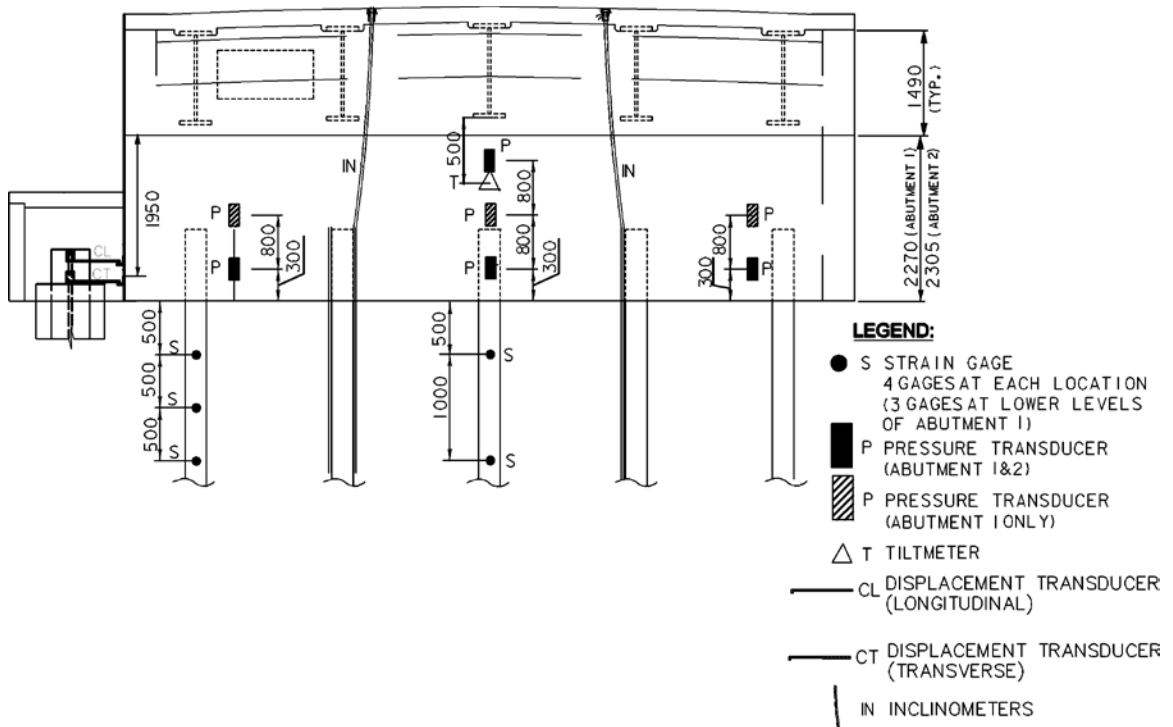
Abutment Instrumentation at Middlesex Bridge
